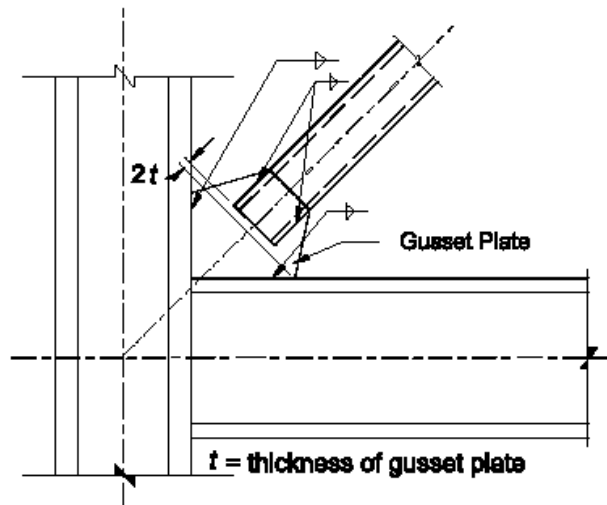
Brace-to-gusset plate requirement for buckling out-of-plane bracing system.
